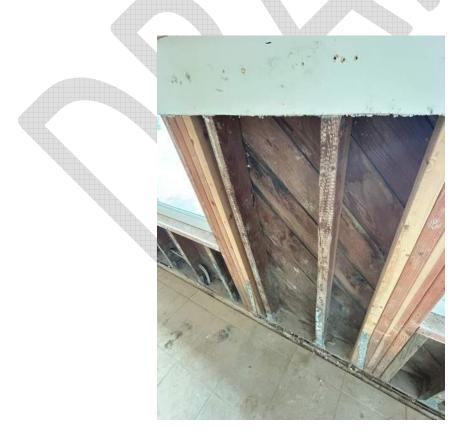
Signs of Water Intrusion at Exterior Wall Sheathing of the Cabin Wood Frame.
